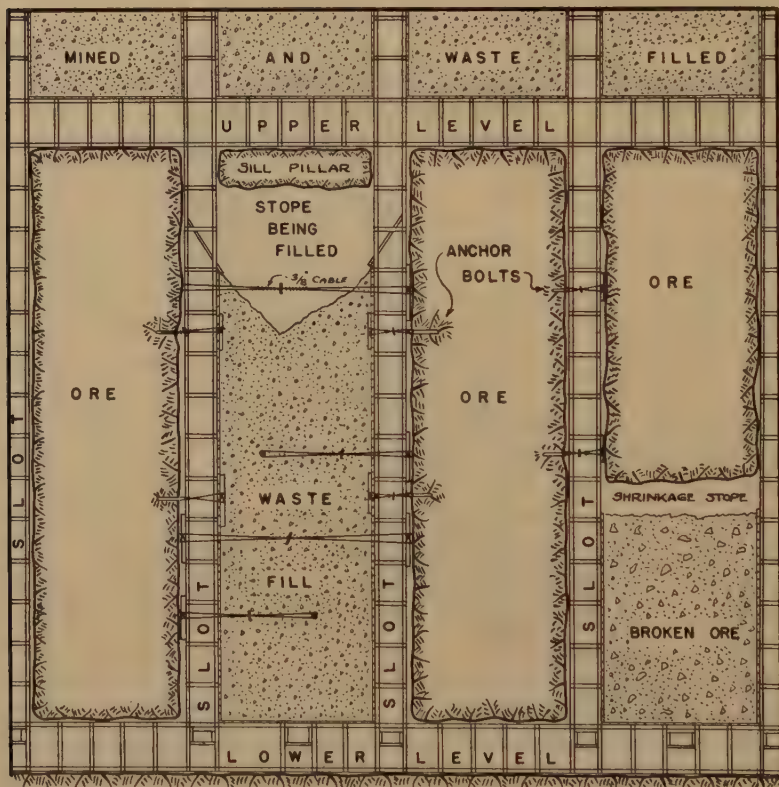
METHOD OF MINING PILLARS BETWEEN SLOTS AND TYING SLOT TIMBERS.
